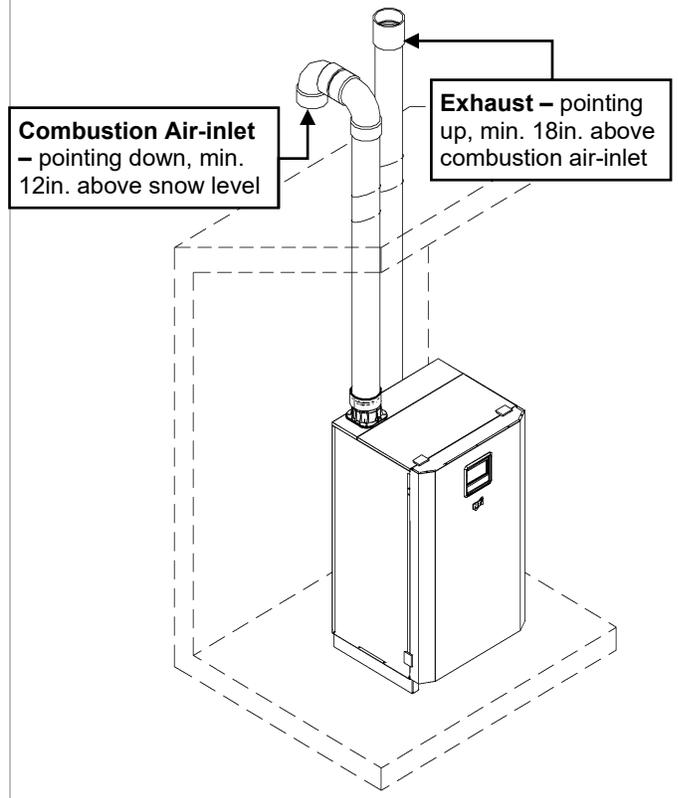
(c) Two-pipe (Rooftop / Sidewall)
